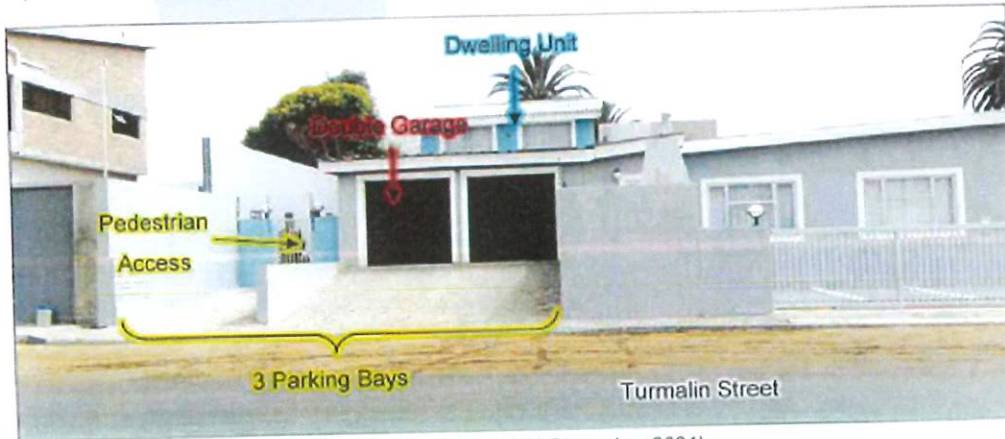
Photo of the site from Turmalin Street (Date: 16 December 2021).
